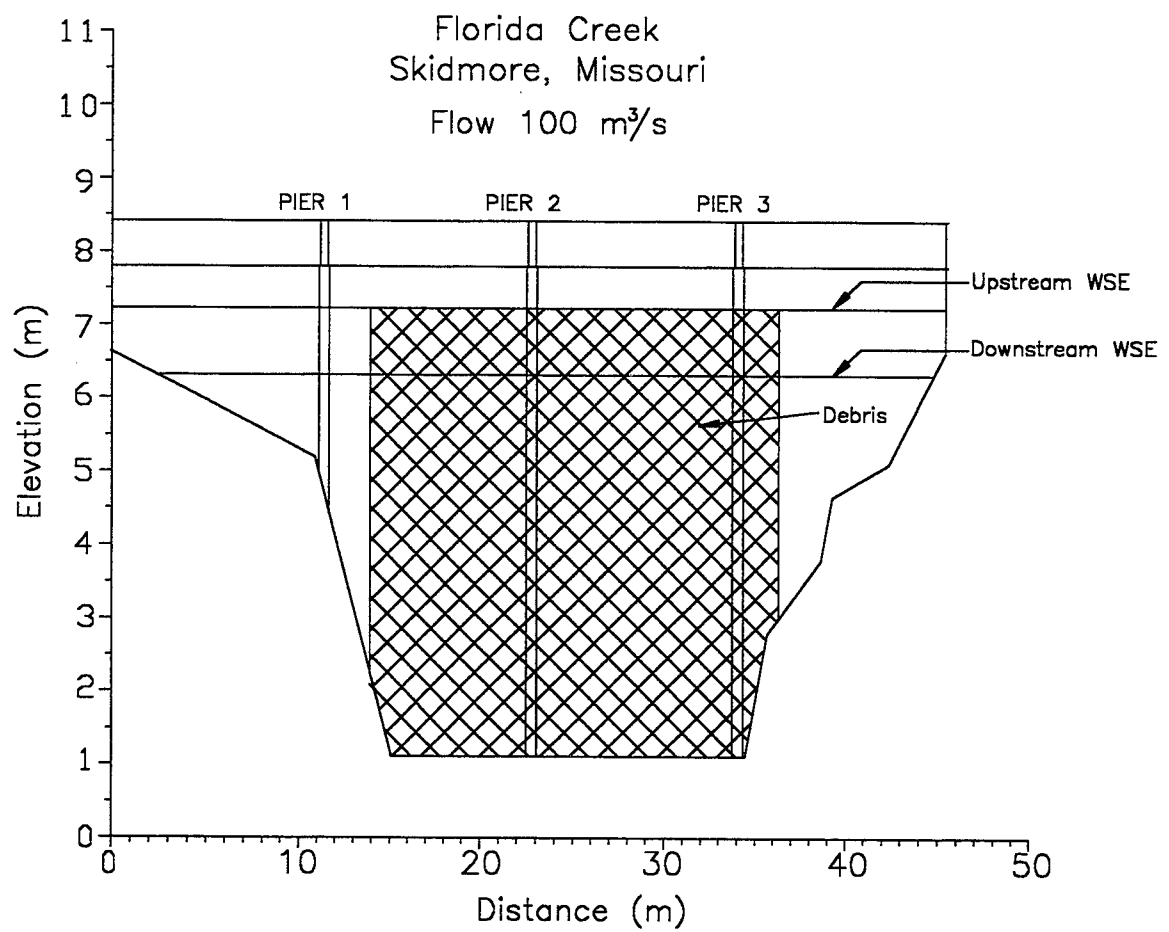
Computed water surface elevations with debris accumulation, Missouri Highway 113 bridge over Florida Creek, near Skidmore, Missouri.
